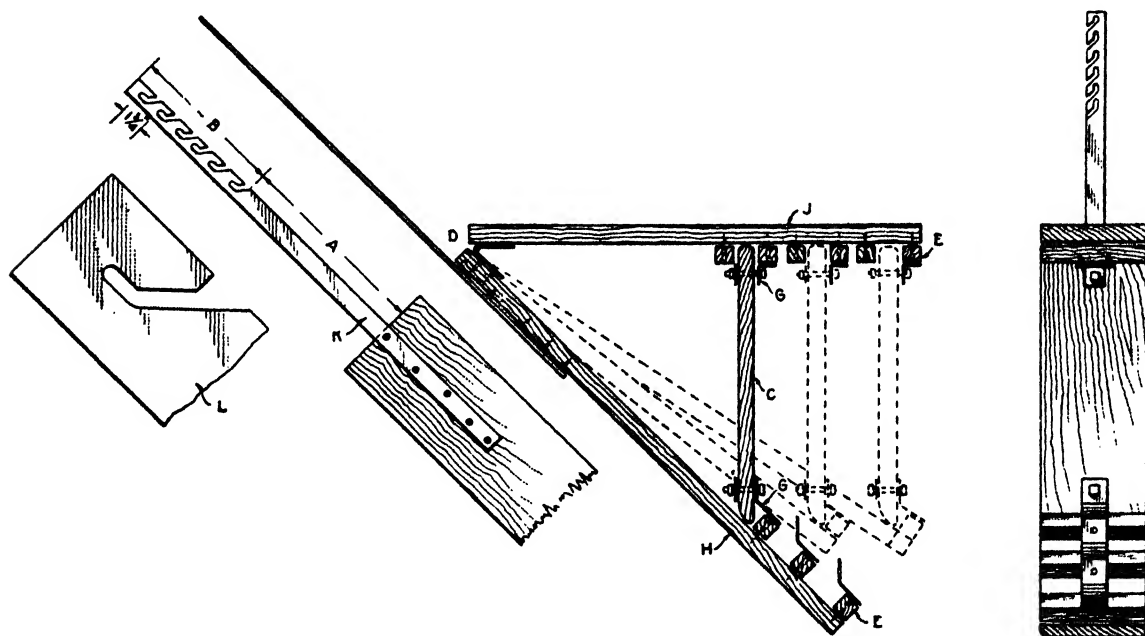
Details of a Slater's Adjustable Scaffold Bracket
